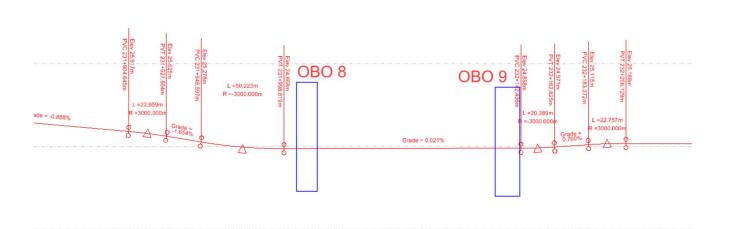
Longitudinal profile between Royal Canal and LUAS Twin Arch Bridge (OBO8) and Maynooth Line Twin Arch Bridge (OBO9).
